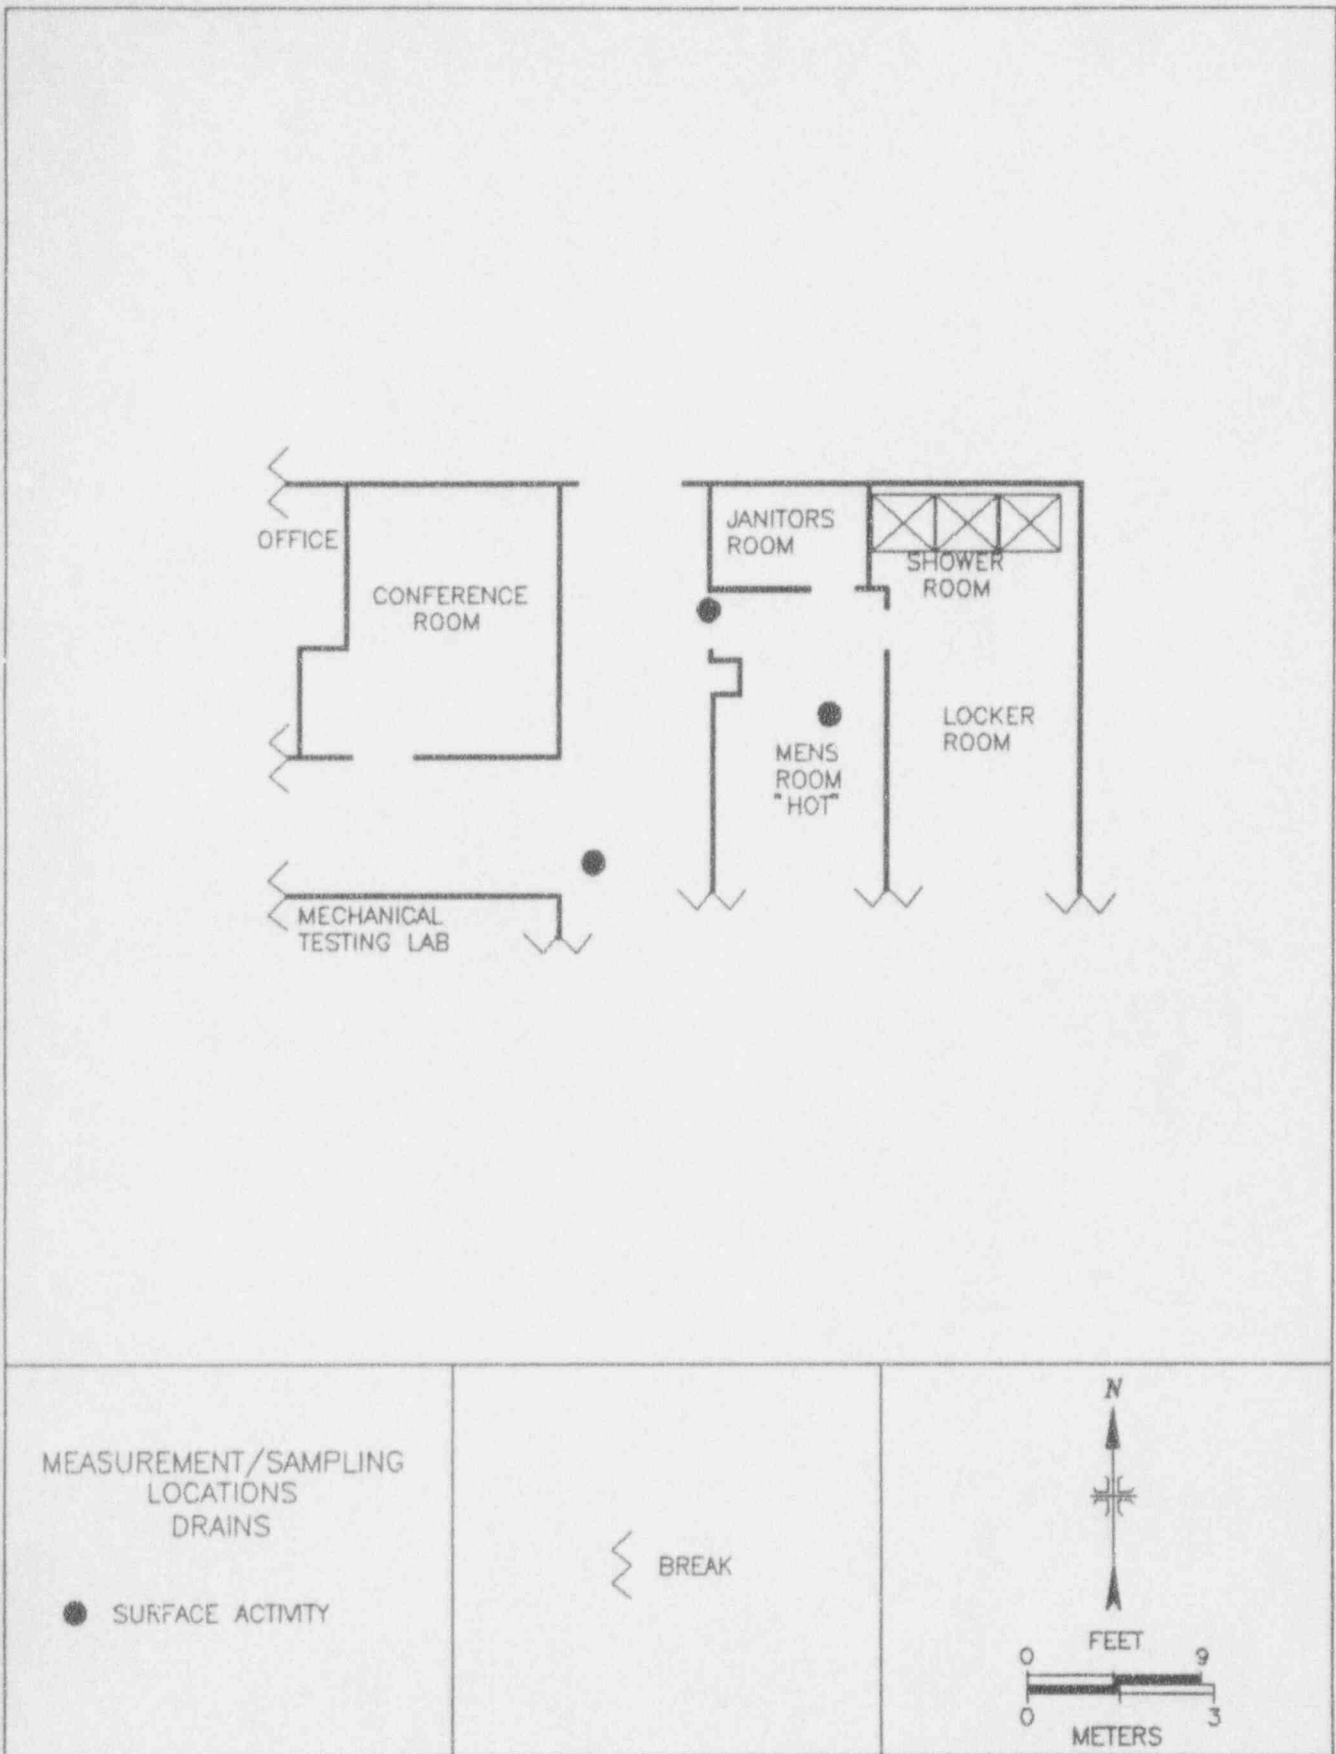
Building 5, Northeast Corner Drains – Measurement and Sampling Locations
